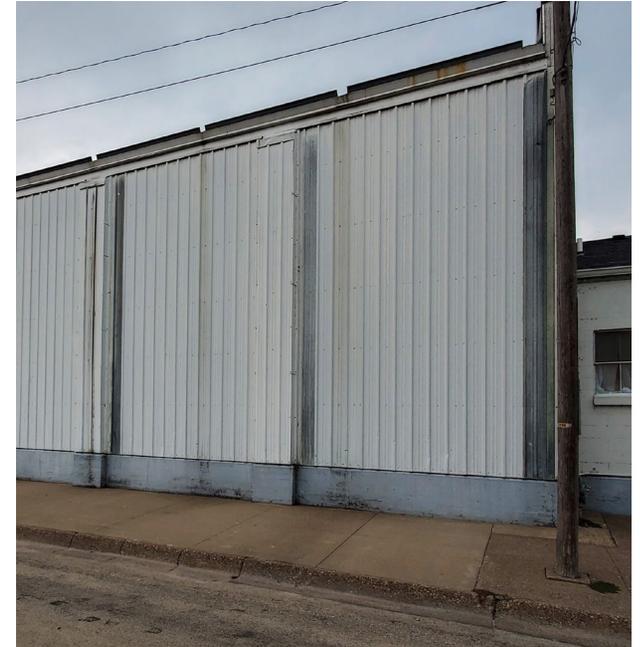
Water sheds directly off roof and onto gym siding below, as can be seen by streaking on the siding and mildew growth on the foundation.
